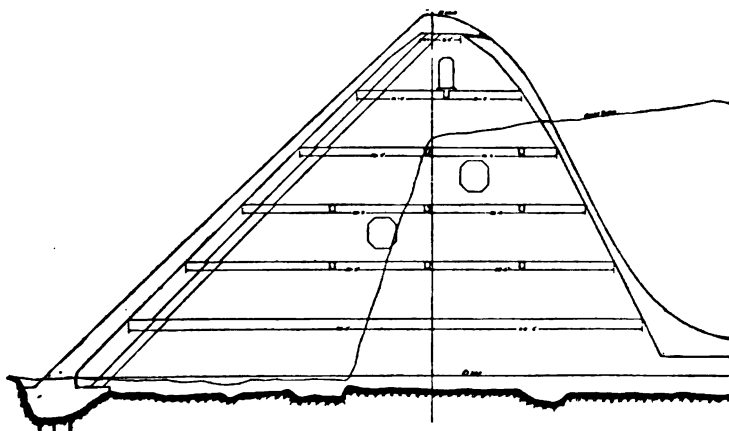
SECTION OF DAM THROUGH SPILLWAY.
